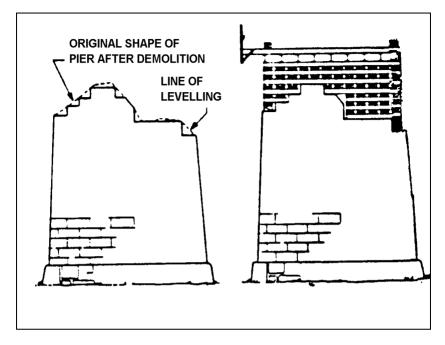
Levelling the Top of a Damaged Pier
